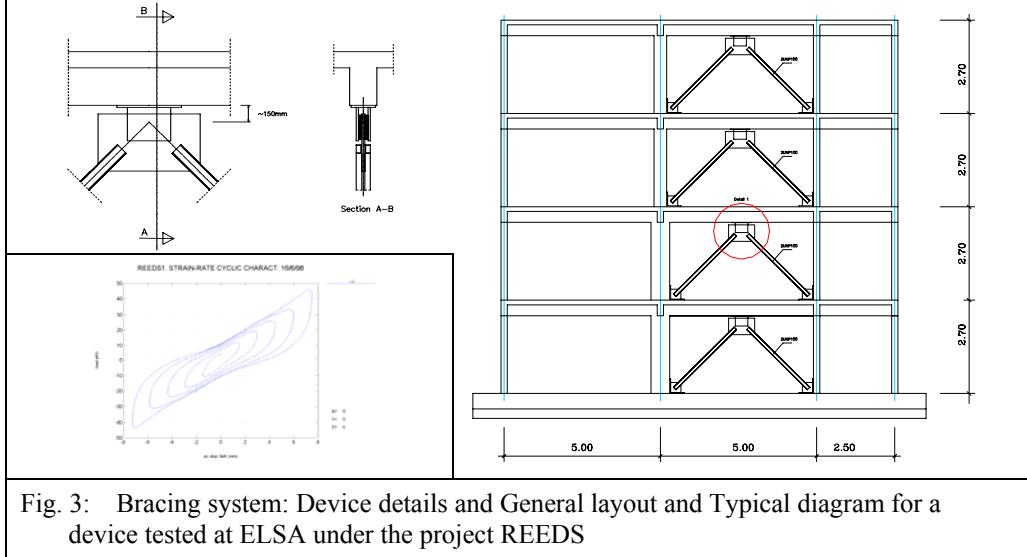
Bracing system: Device details and General layout and Typical diagram for a device tested at ELSA under the project REEDS
